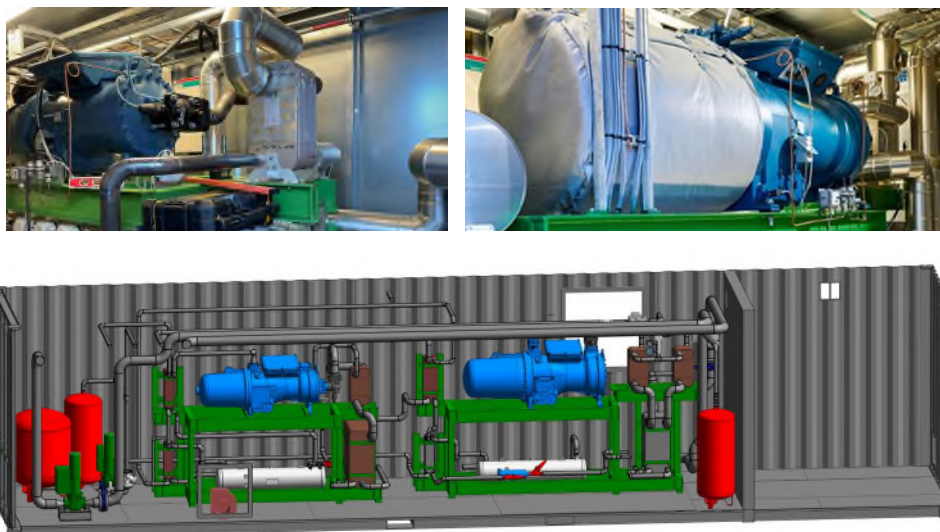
Pictures and 3-D arrangement drawing of the HTHP system
